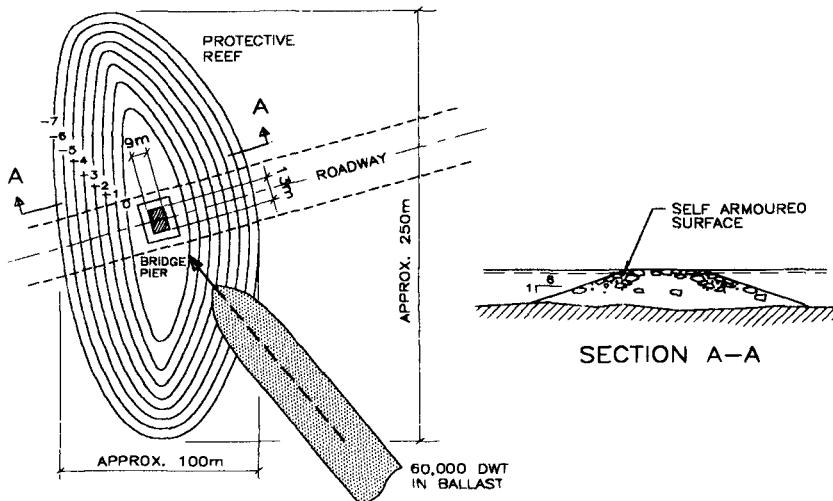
Protective work for one side span foundation of the Great Belt suspension bridge, Denmark.
